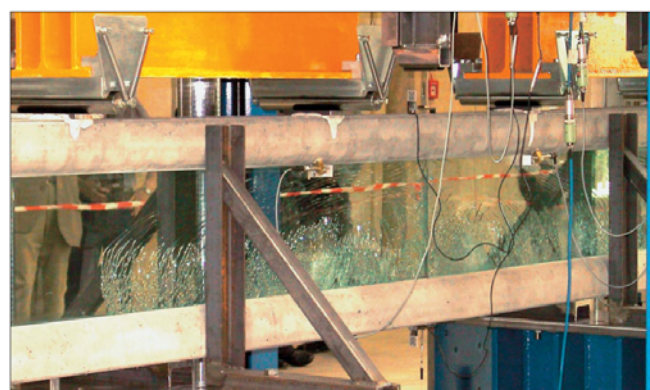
, Glass-concrete composite beam by TU Graz. [22]
